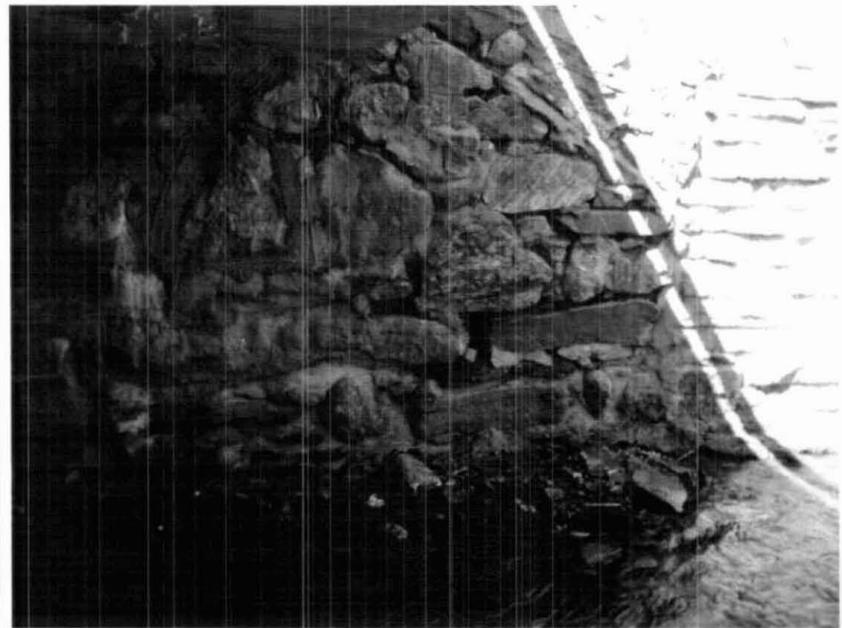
NORTH END OF ABUTMENT # 1 WITH STONE VOIDS.
